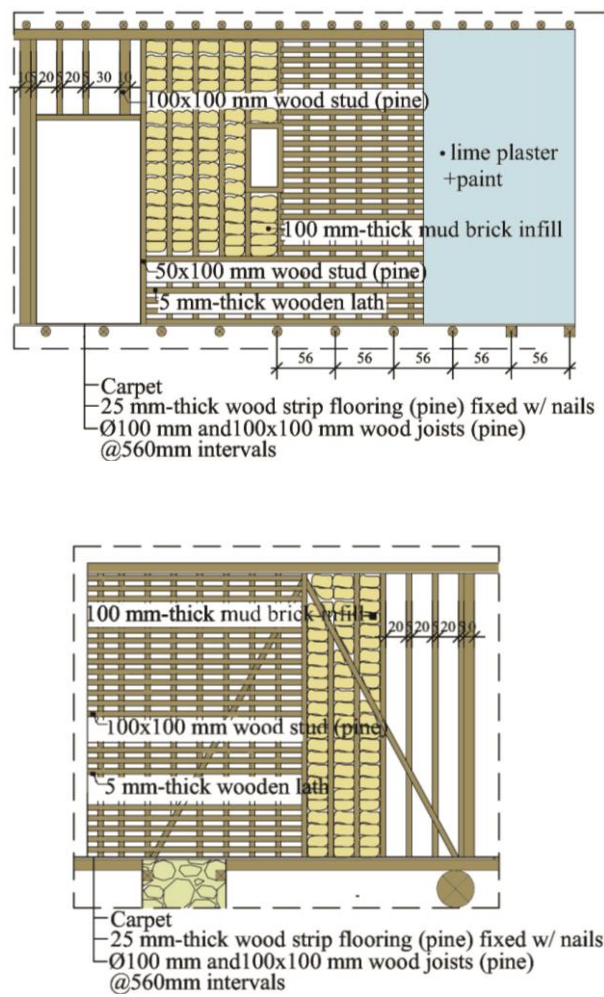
Elevations of Original-Wall 4 & sections of Original-Floor 4 in 1/50 scale (Drawn by author).
